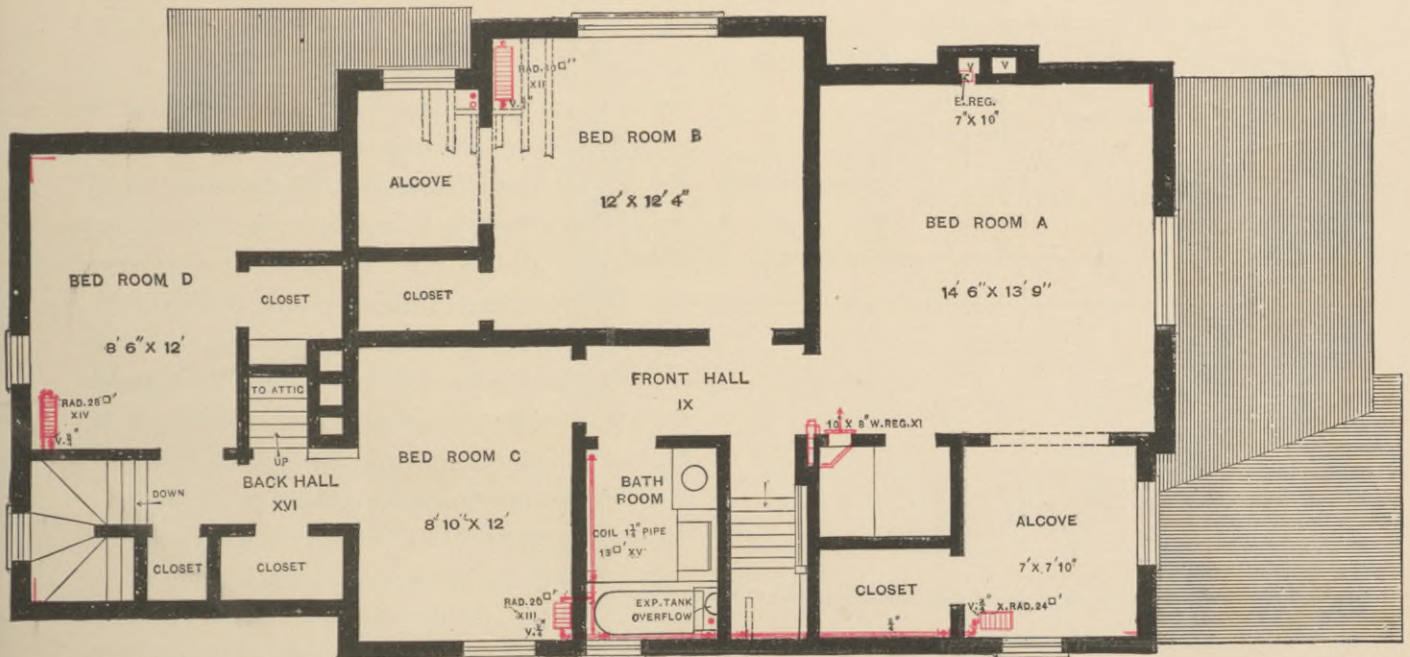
Plan of Second Floor of Cottage Residence. Scale 1/8 inch to the foot.
